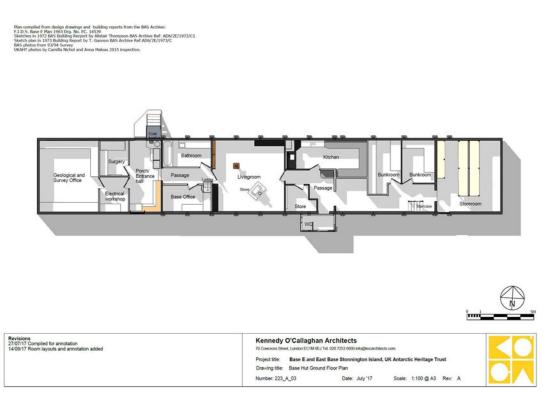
Completed architectural floor plan of Base E (Source: UKAHT)
